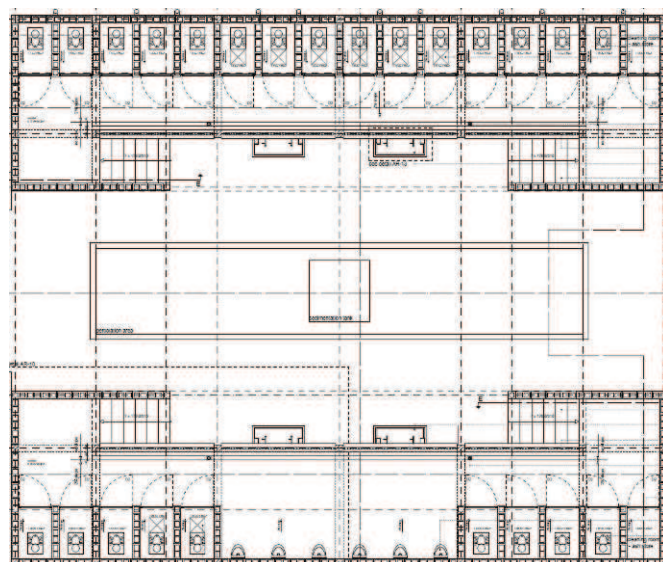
The floor plan of the UDDTs complex. Top: female section; Bottom: male section (Source: GTZ-IS (2008))
